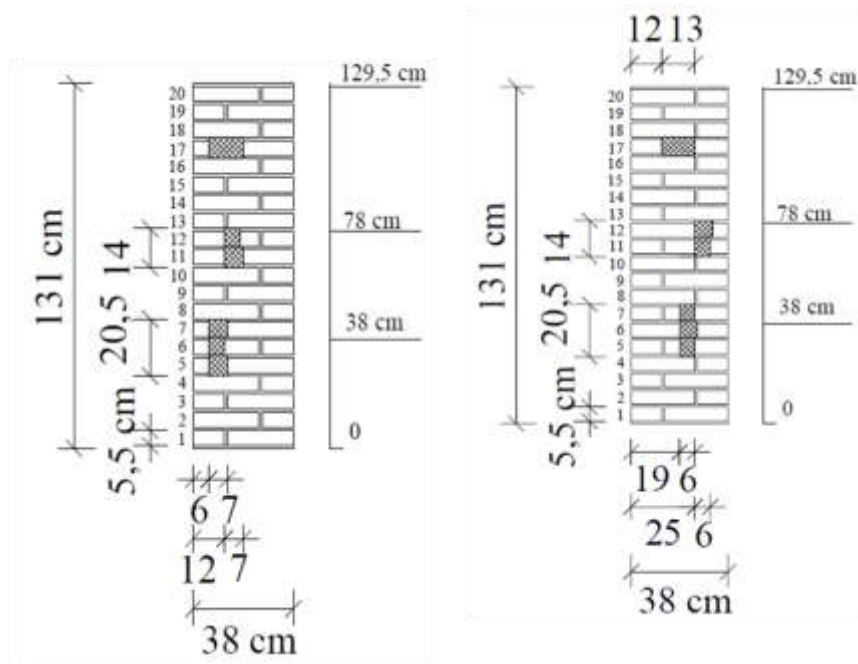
Section A-A, wall PNDE (left). (Colla and Gabrielli, 2010) ; Section B-B, wall PNDE (right) (Colla and Gabrielli, 2010)
